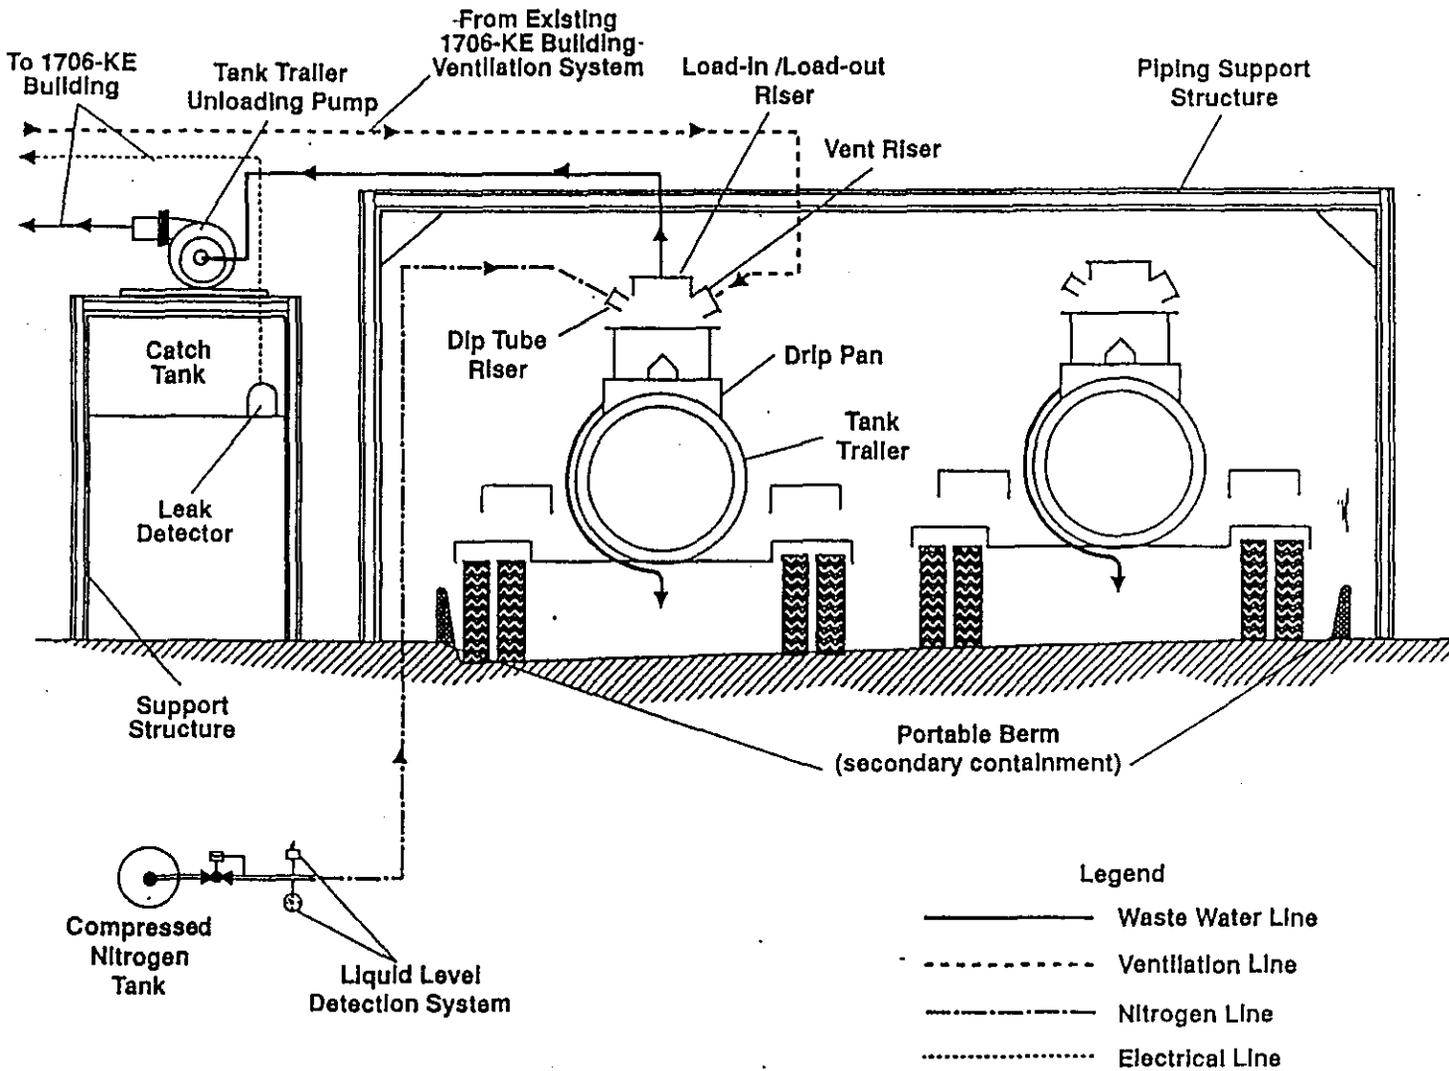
Waste Load/Unload Station at the 1706-KE Building.
